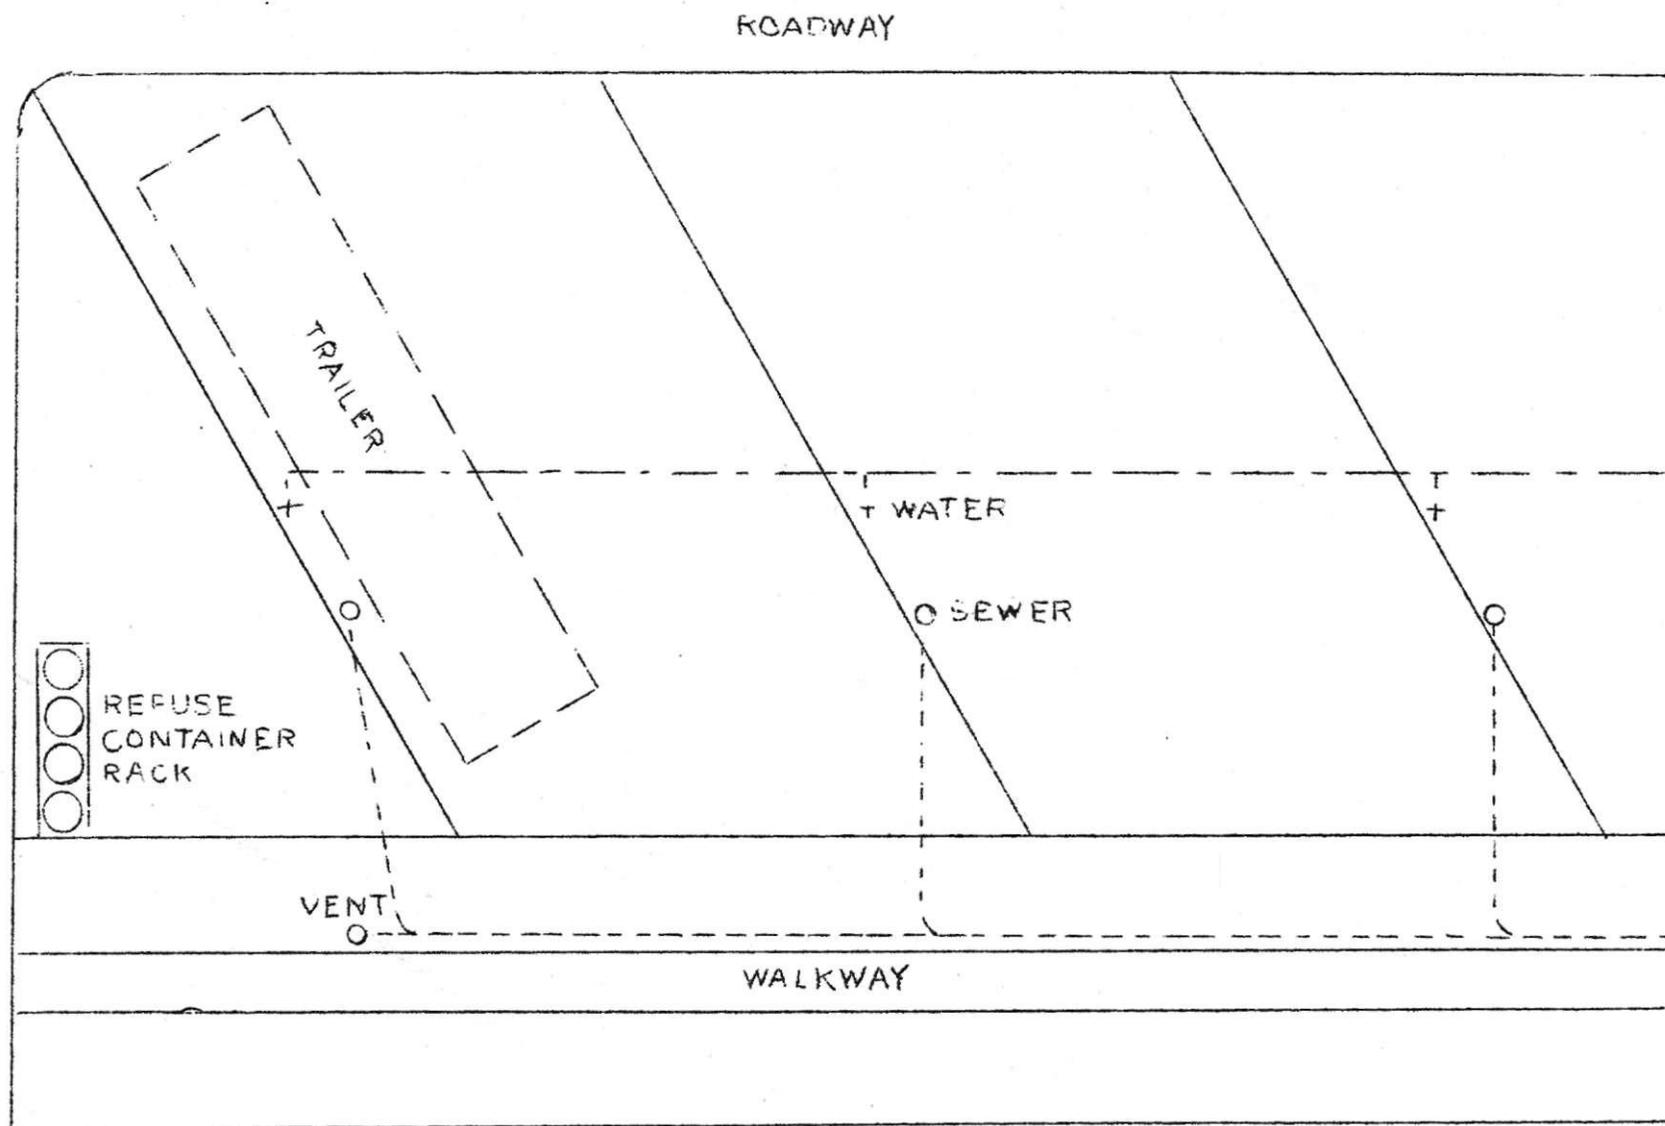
TYPICAL LAYOUT OF TRAILER SPACE
